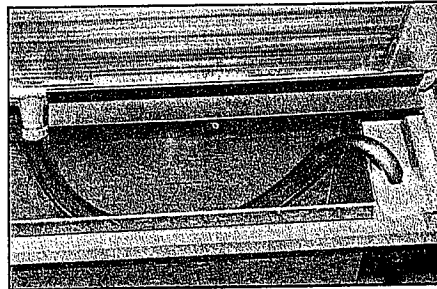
Inside of unit at return-air duct flange, showing sealed corners and sealed condensate tube opening.
